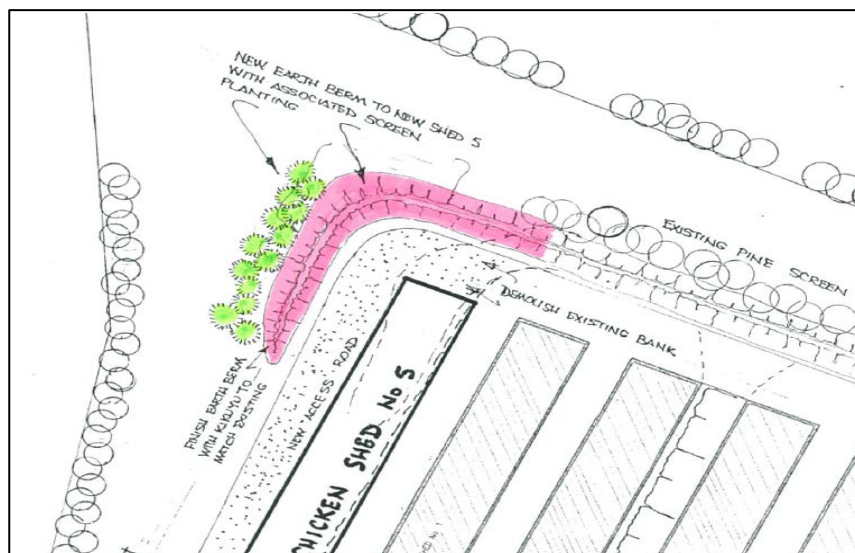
Proposed extension of landscaping and berm near corner of new shed – new mound in pink, new trees in green
